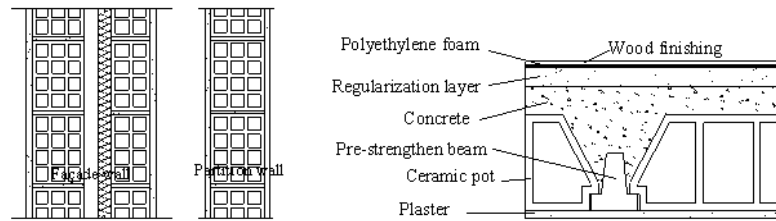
Vertical cross-section of the construction solutions of the walls and floors of the buildings (external and partition elements)
